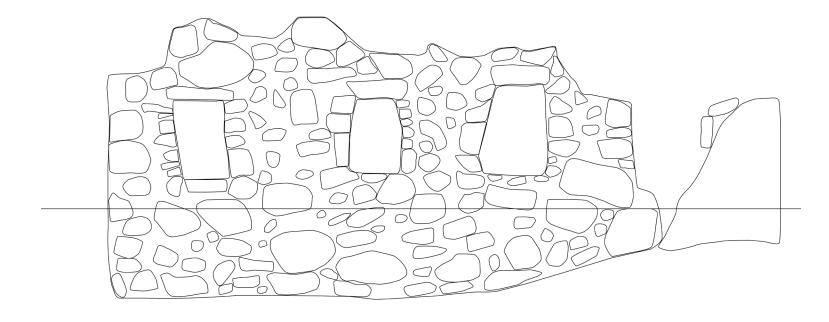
Inside elevation of the East wall of Building NC7, Kañaraqay
